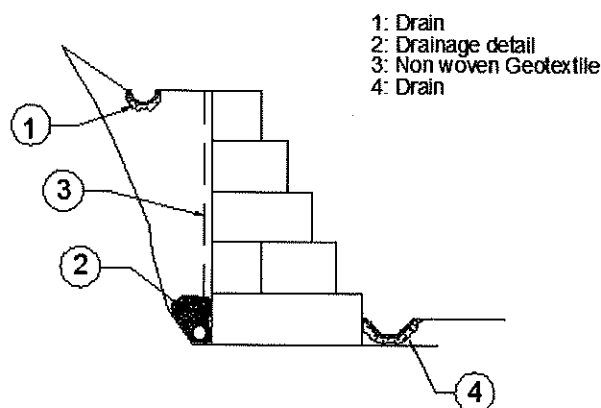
Drainage System for Gabion Retaining Wall for Heavy Rainfall Condition
